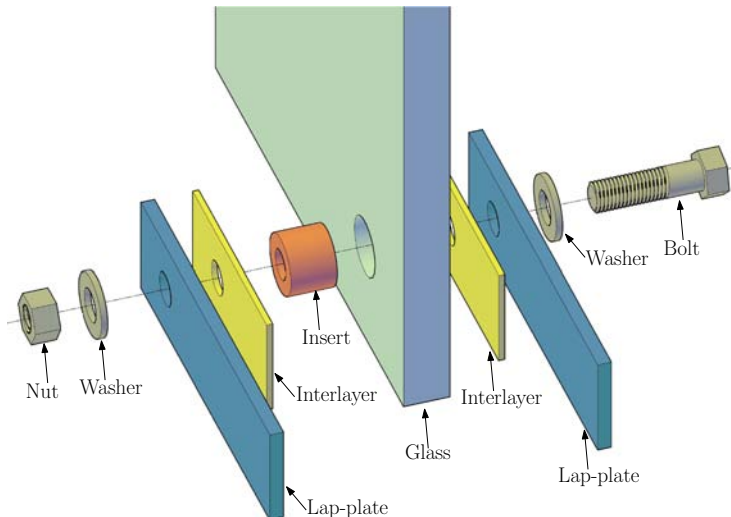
Exploded view of the components in a typical pinned joint.
